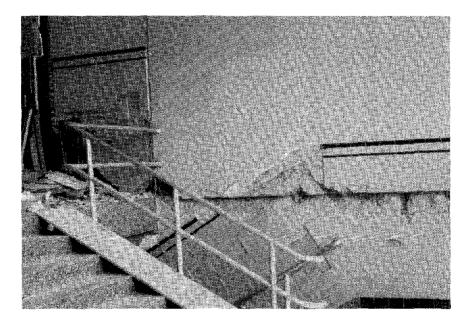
Displacement at construction joint, Anchorage West High School, 1964 Alaska Earthquake. (Photo courtesy of the American Iron and Steel Institute.)
